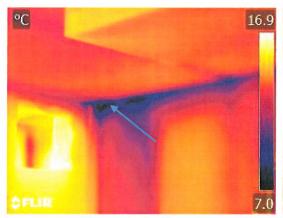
Heat loss at typical beam connection Photo 7: Location of thermal image and cold spot
